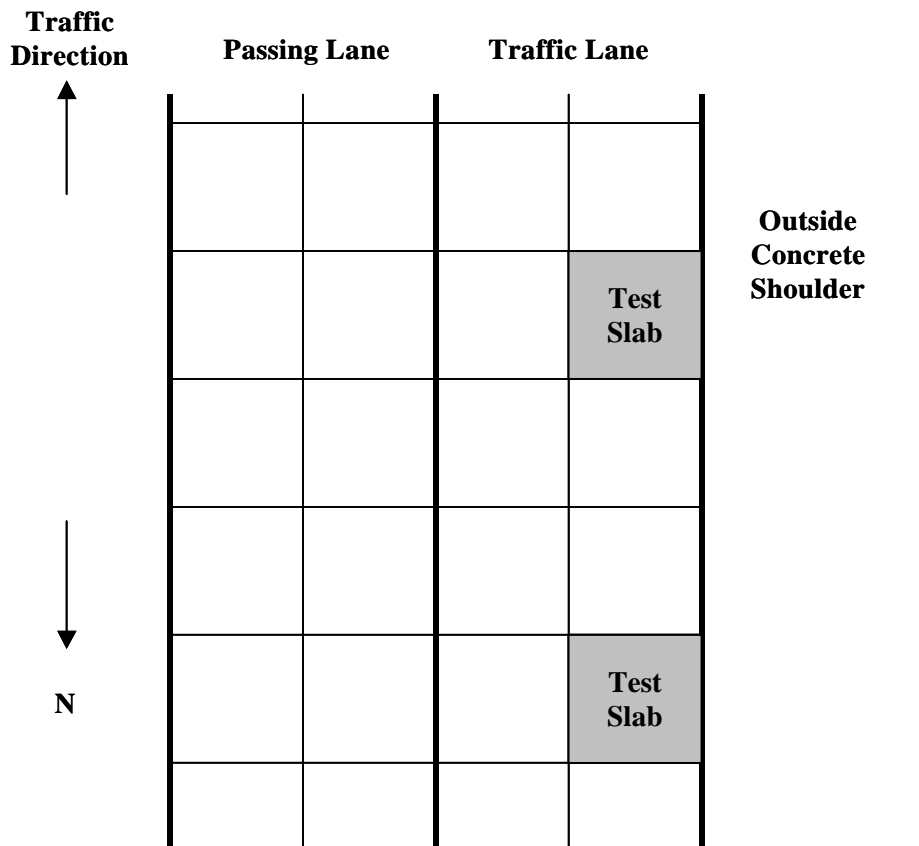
Typical Layout of Test Slabs within Each Test Section
